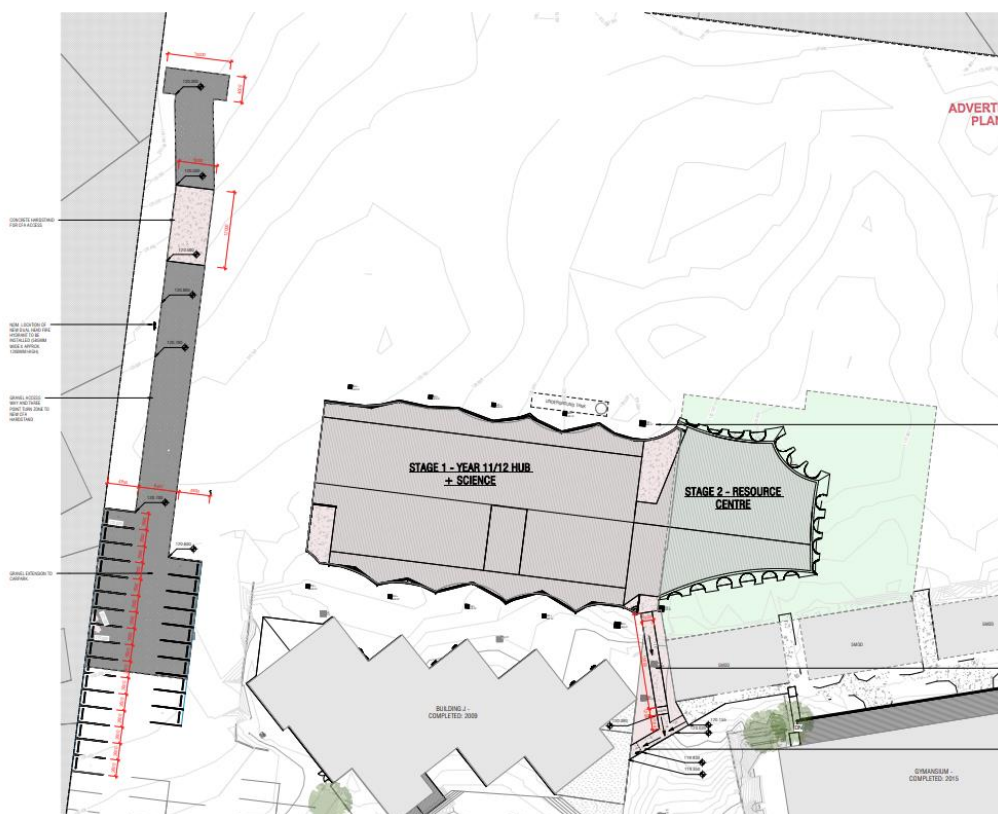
Overall development depicting Stage 1, Stage 2 and works to the car parking area
